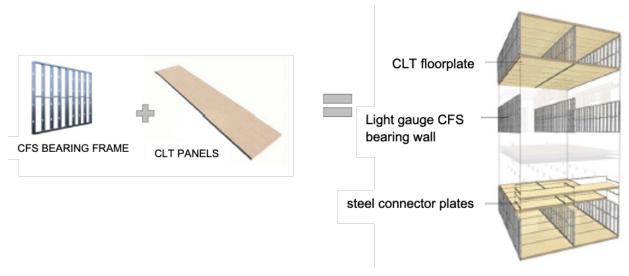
Novel CLT/CFS system (image courtesy Timber Engineering, Inc)
